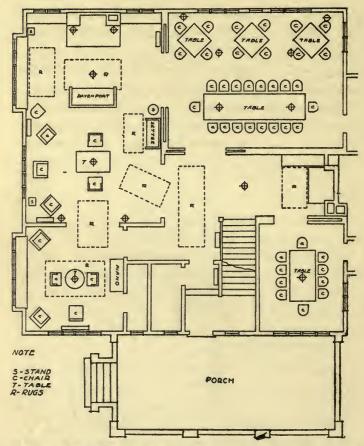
Plan Showing Method of Laying Out Furniture and Rugs.
